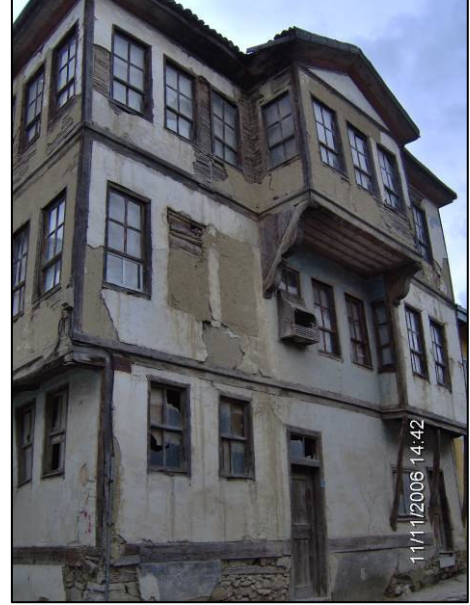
Detail of timber framed construction on Hisar Evi – division of wall into small parts by tie beams, as seen in the figure, was called “*çatı*”.
